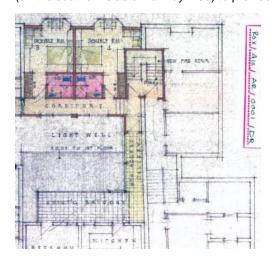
Plan for alterations to the rear of 137 and 139–141 George Street, Second Floor 1984 (detail). The new fire stair took up part of the floor area of Room 30 (2.43) of The Russell Hotel and part of the adjacent hallway (2.40). Source: PMNSW - ROX 410 AR 0001/DR.
